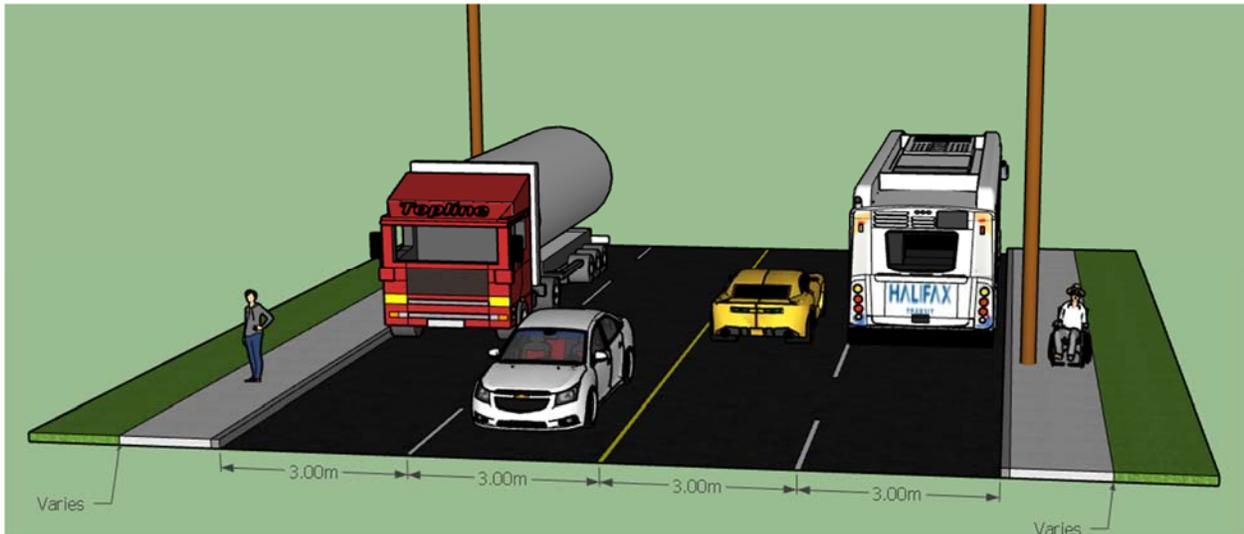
Typical existing cross section – Barrington St, between North St and Devonshire Ave
